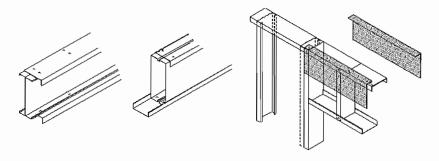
Back-to-Back, Box and L-Header Assemblies
